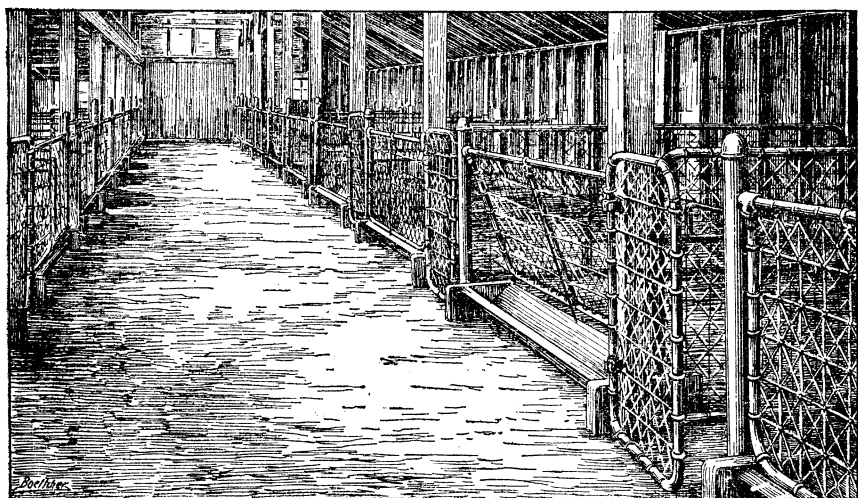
Interior arrangement of hog house at the Illinois Experiment Station.
